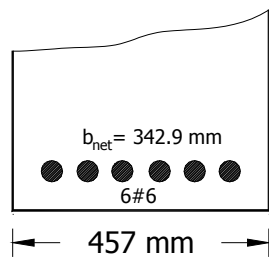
Typical sketch of longitudinal section of a reinforcing bar
